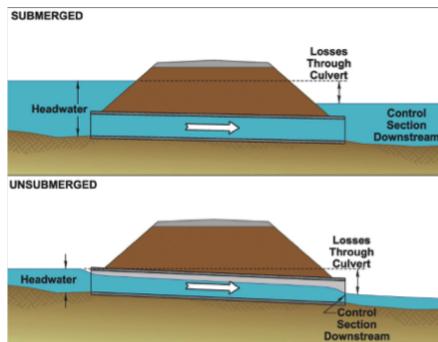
(b) Typical Outlet Control Flow Conditions
